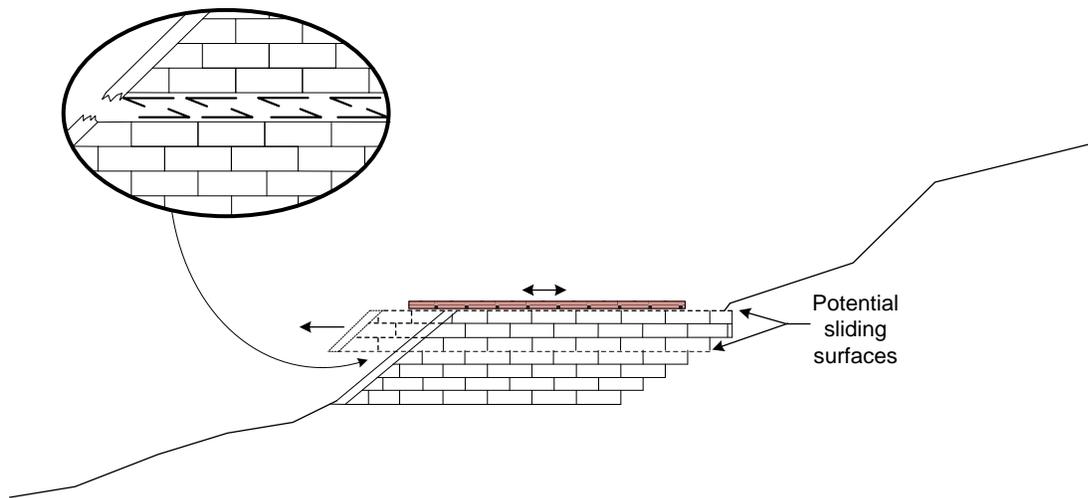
Internal seismic stability failure involving horizontal sliding between blocks and/or between the pavement system and upper layer of blocks due to seismic loading.
